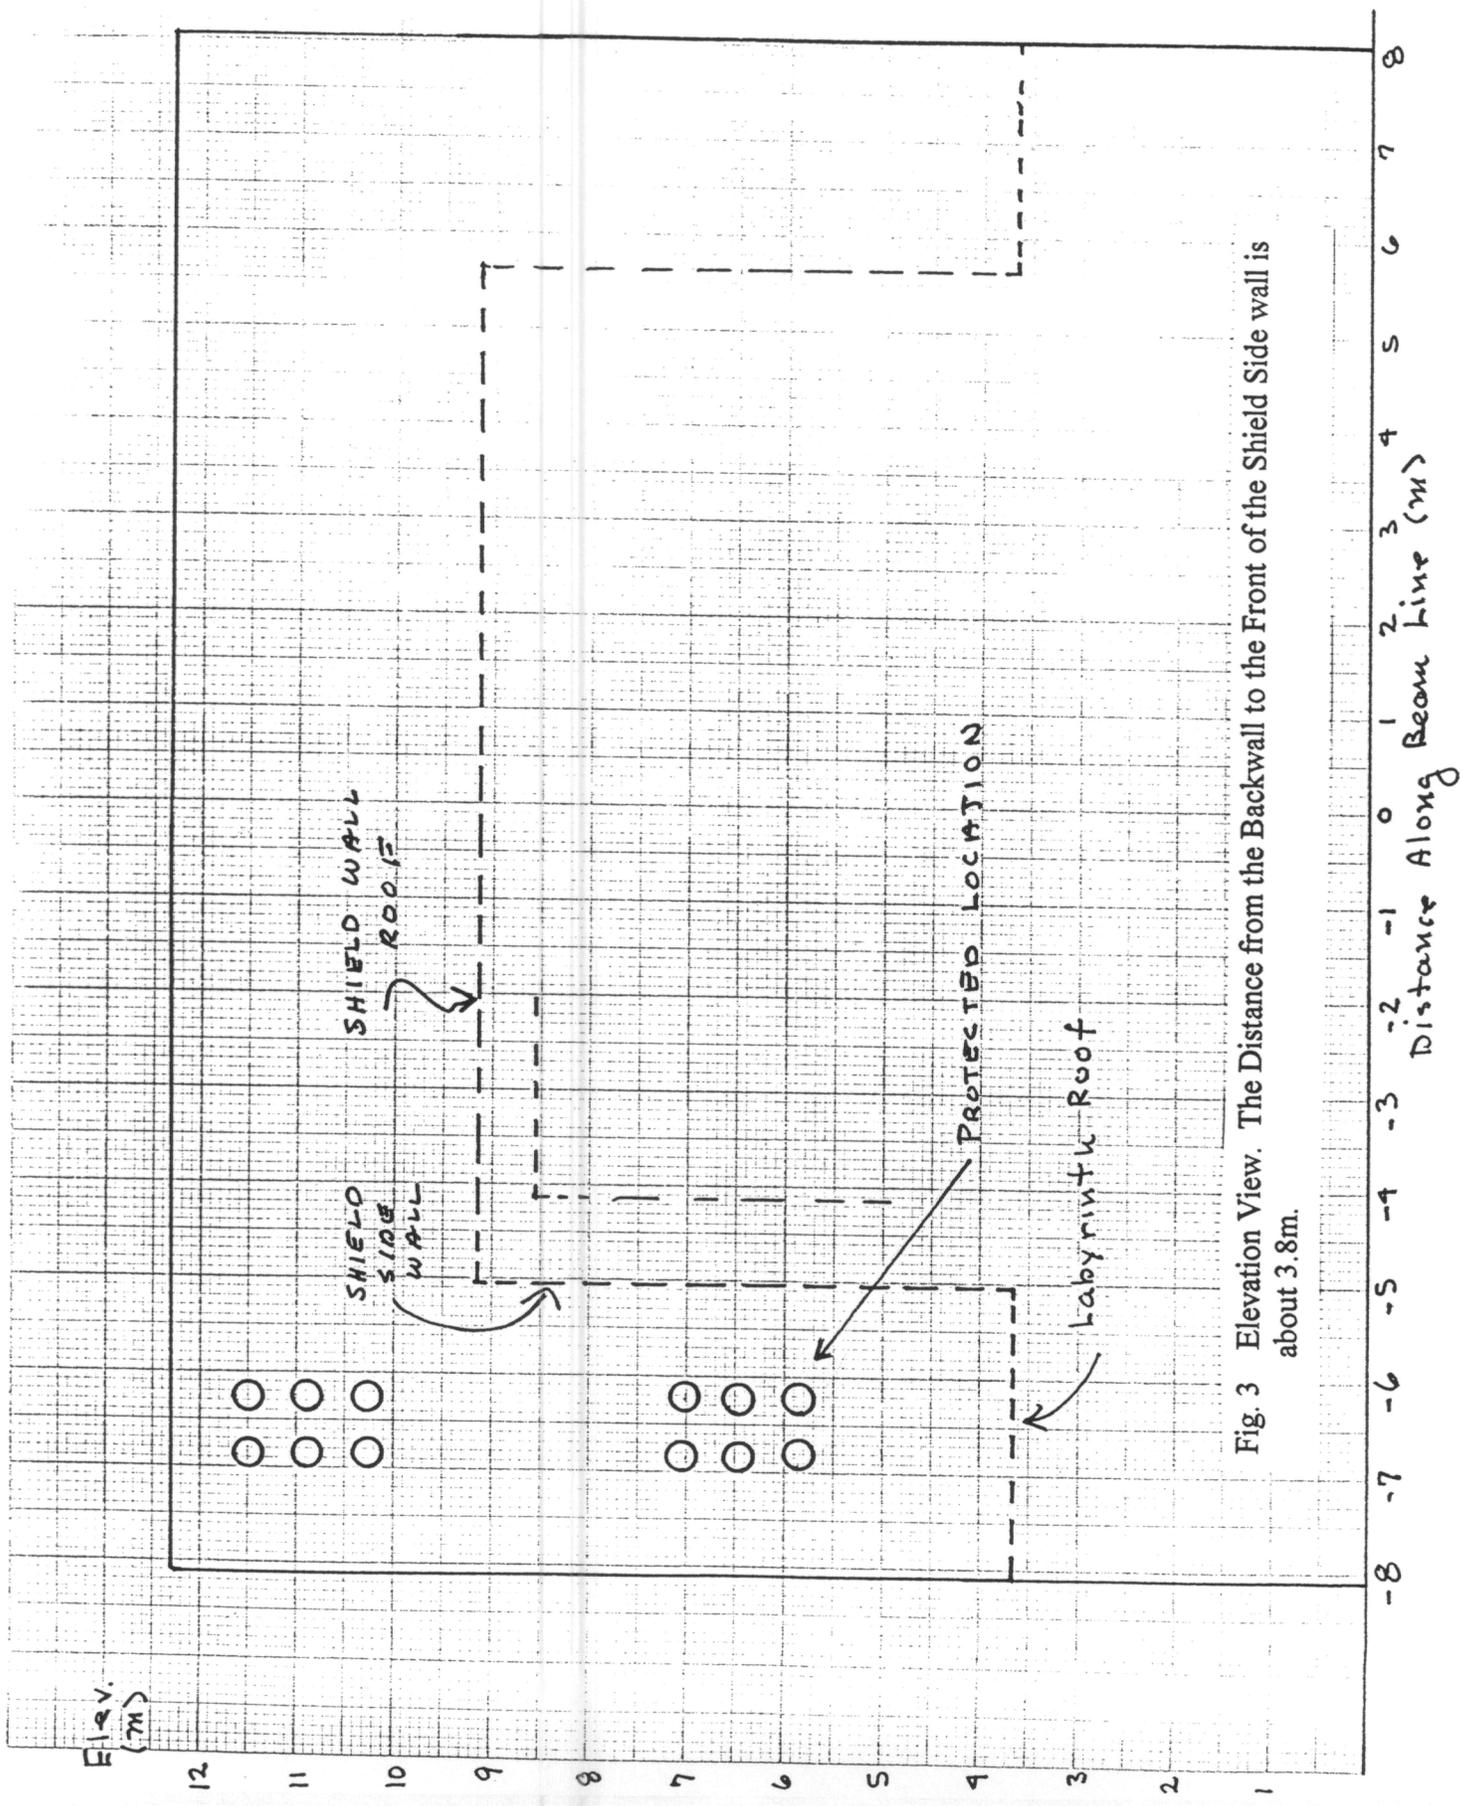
Elevation View. The Distance from the Backwall to the Front of the Shield Side wall is about 3.8m.
